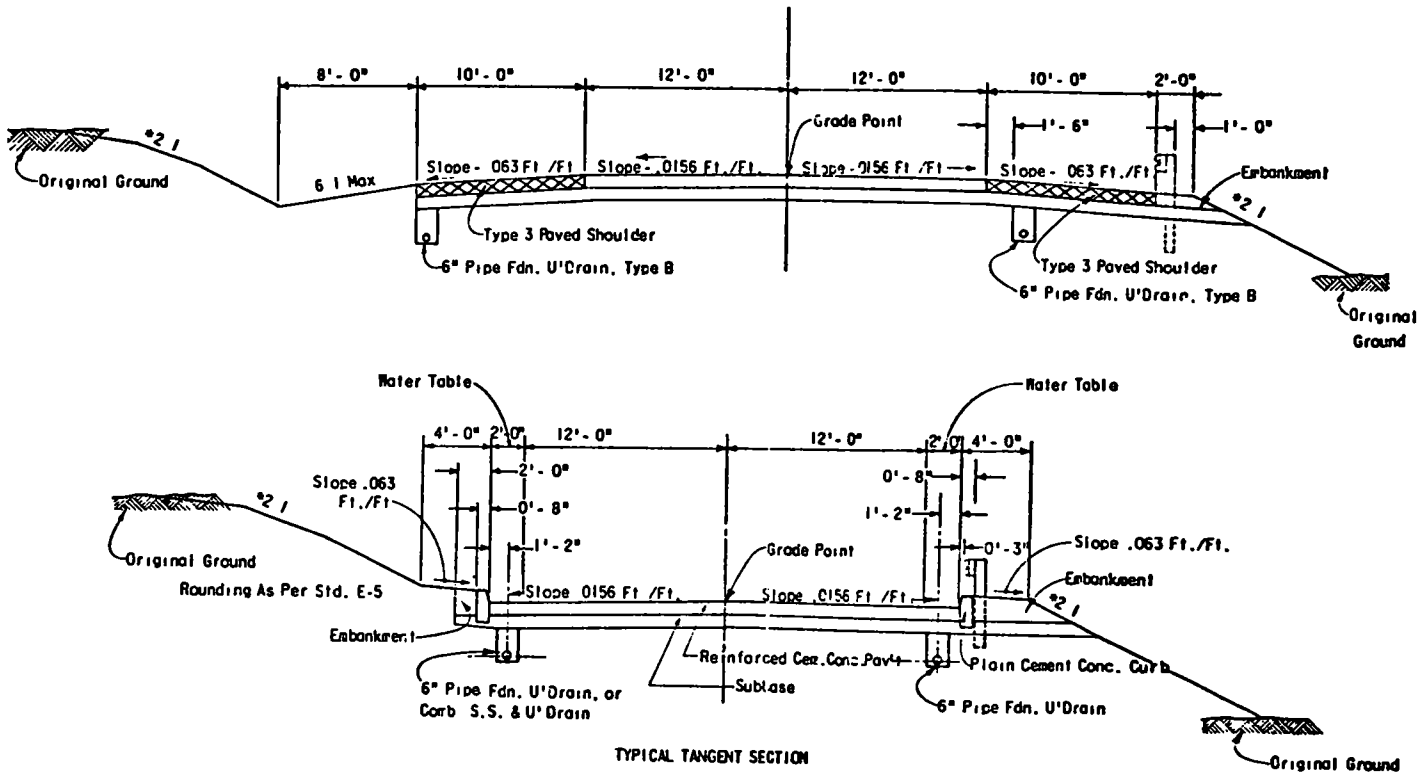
Typical cross sections, PATways, Pittsburgh, Pa
